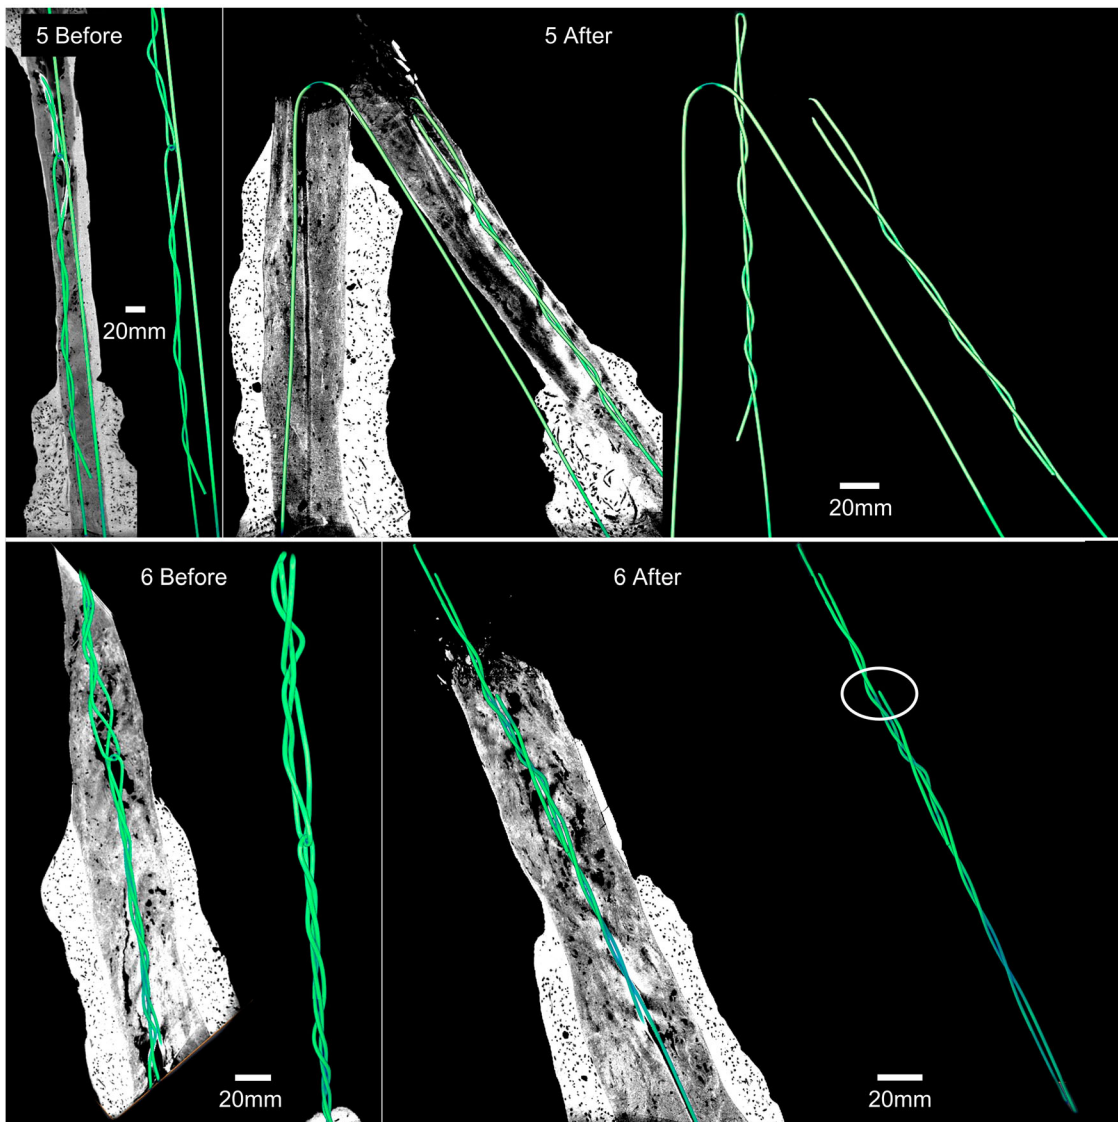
Failure specimens of CFG reinforced wads with steel wires – sample groups 5 and 6: looped (group 5, a – d) and looped-twisted (group 6, e – i). Group 5 looped steel wires elongated and typically supported slightly lower maximum loads but did not break (although CFG fibres did). Group 6 wires could support slightly higher maximum loads, but wires did break in addition to the CFG fibres, resulting in specimens entirely broken in two. CFG samples typically displayed less small plaster cracks in multiple locations than hessian groups, but more pronounced primary cracks prior to failure.
